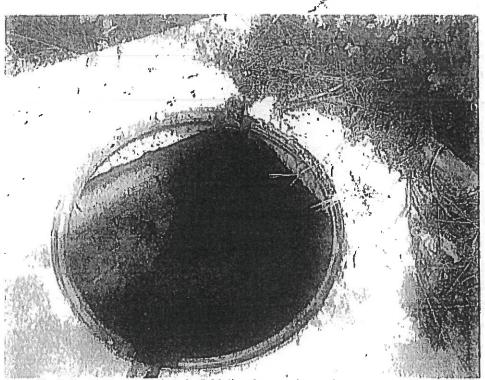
Contaminated manhole in field directly opposite septic tank serving Mr. Mc Daids Dwelling. 13/07/2011
